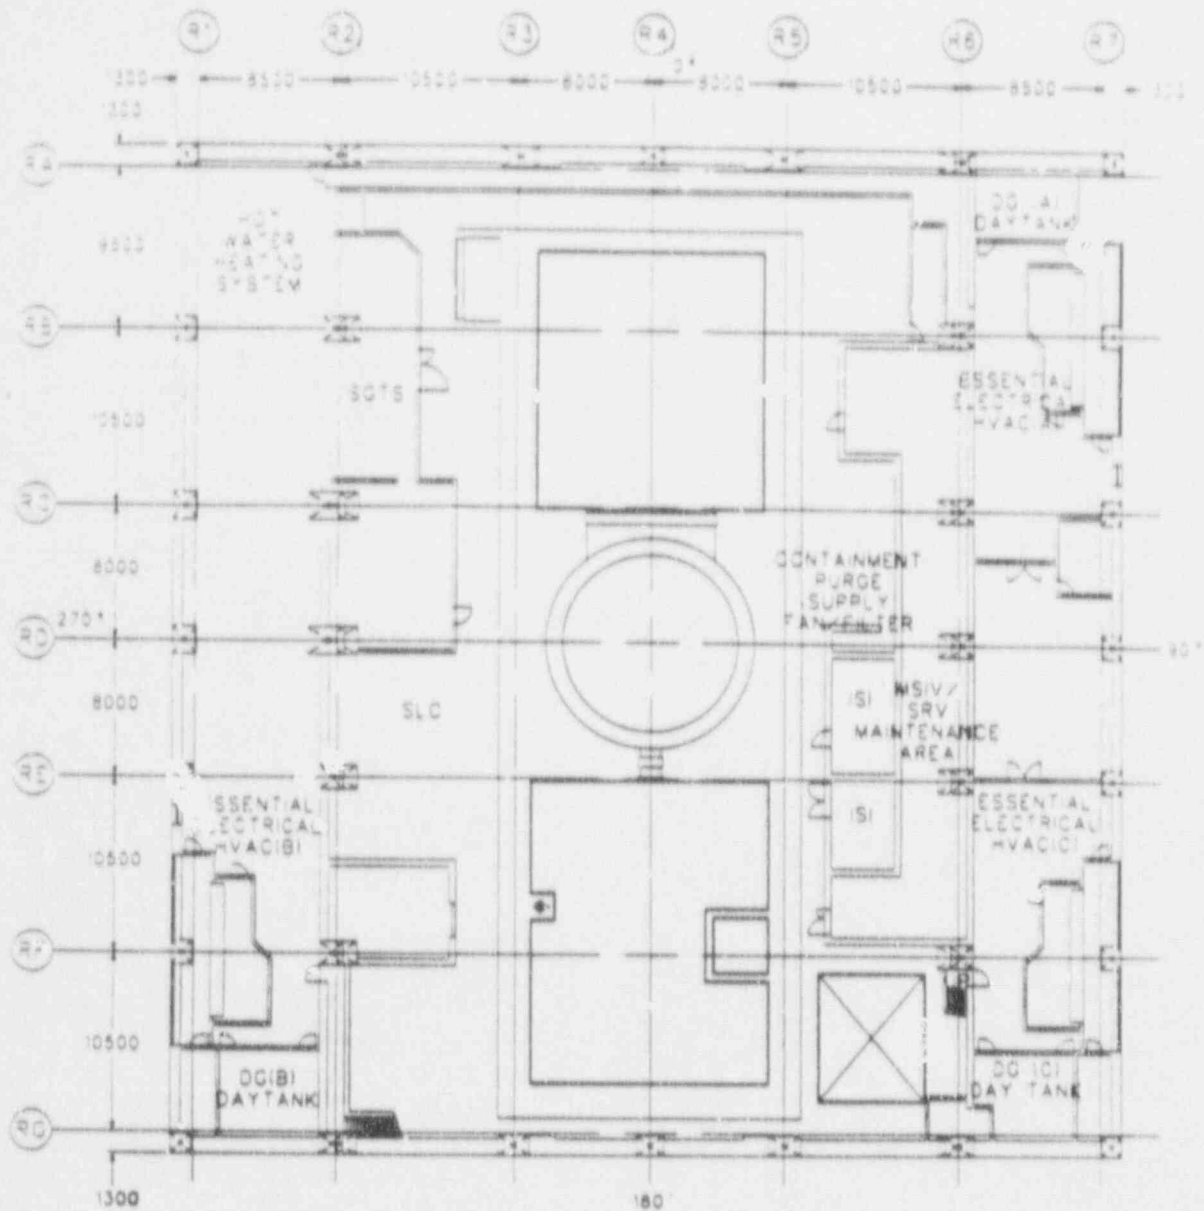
Reactor Building Arrangement—Elevation 18100 mm
